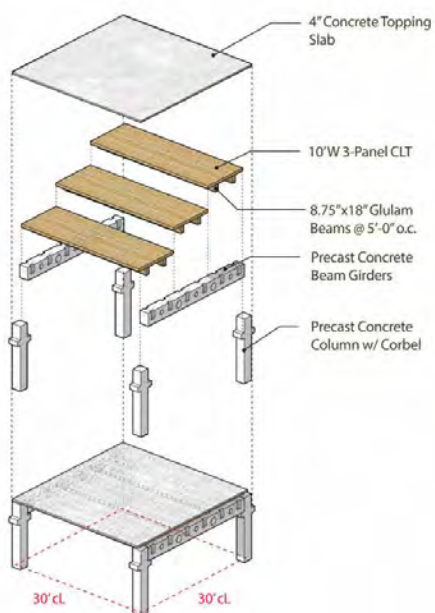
PRECAST CONCRETE AND TIMBER HYBRID STRUCTURE<sup>14</sup>
